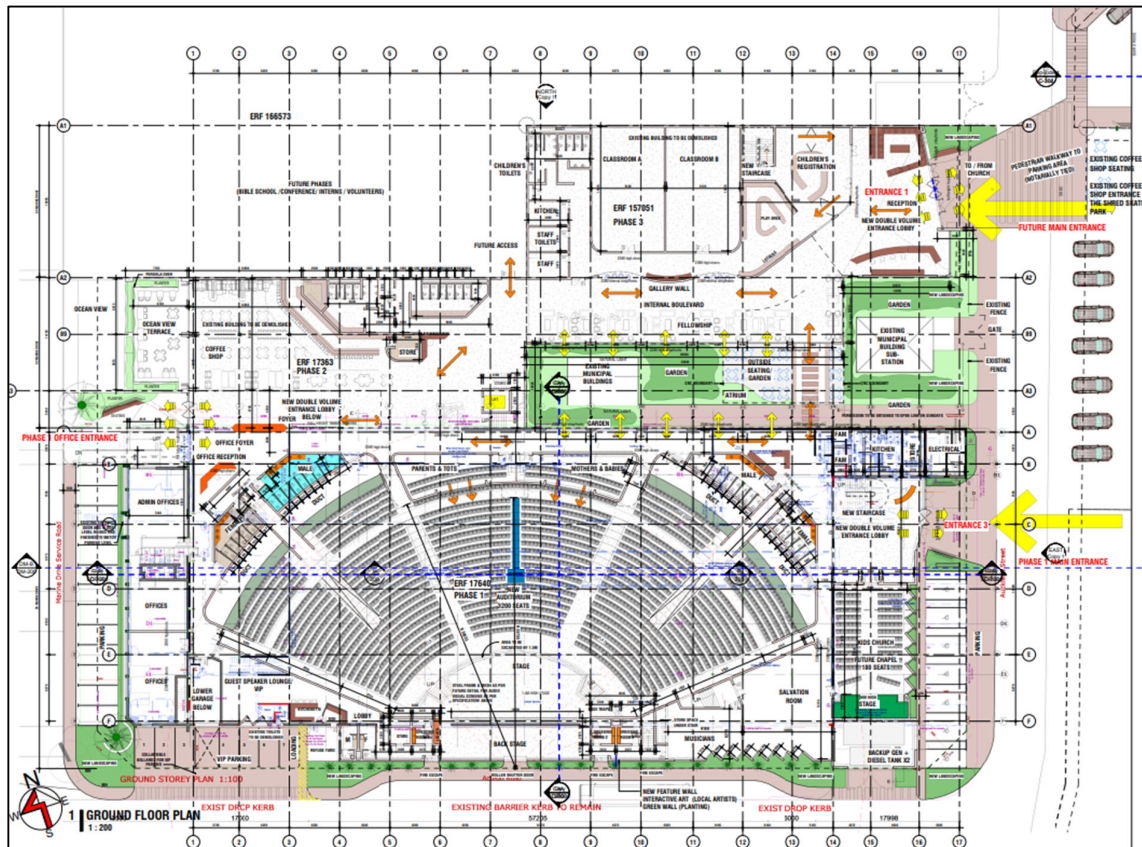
Proposed Site Development Plan (Ground Floor)
